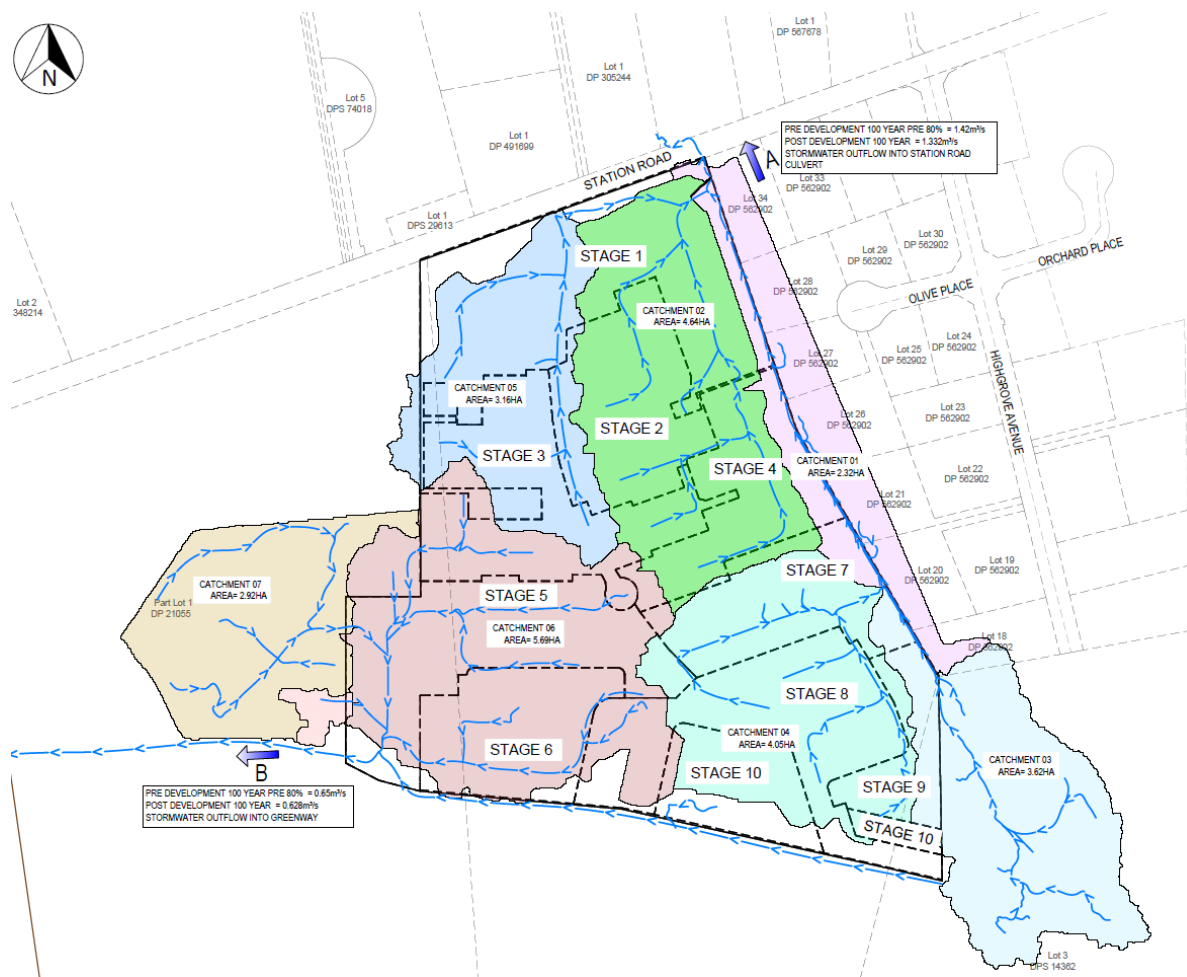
Stormwater discharge plans for the proposed Retirement Village, as provided by Maven Associates.
